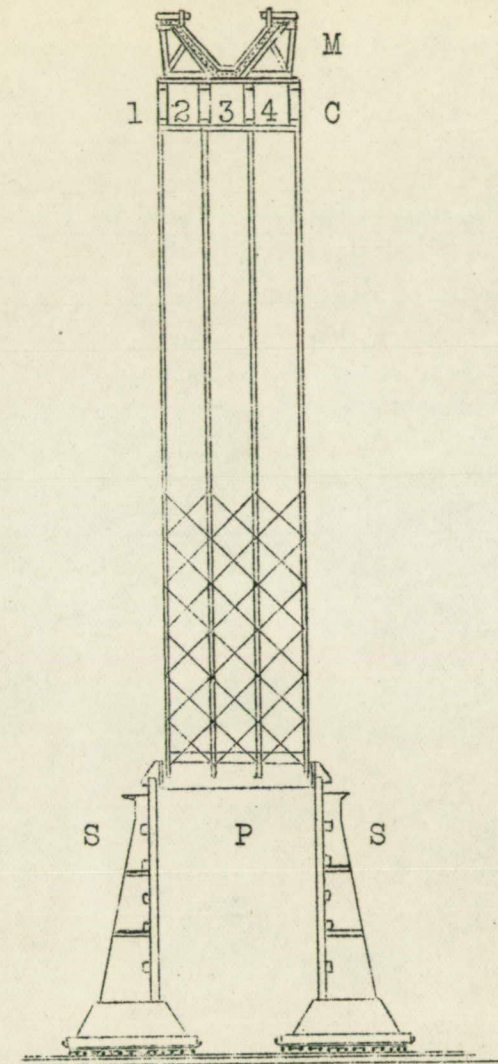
Cross-section of mould showing assembly of elements of wall at one end of shed.
